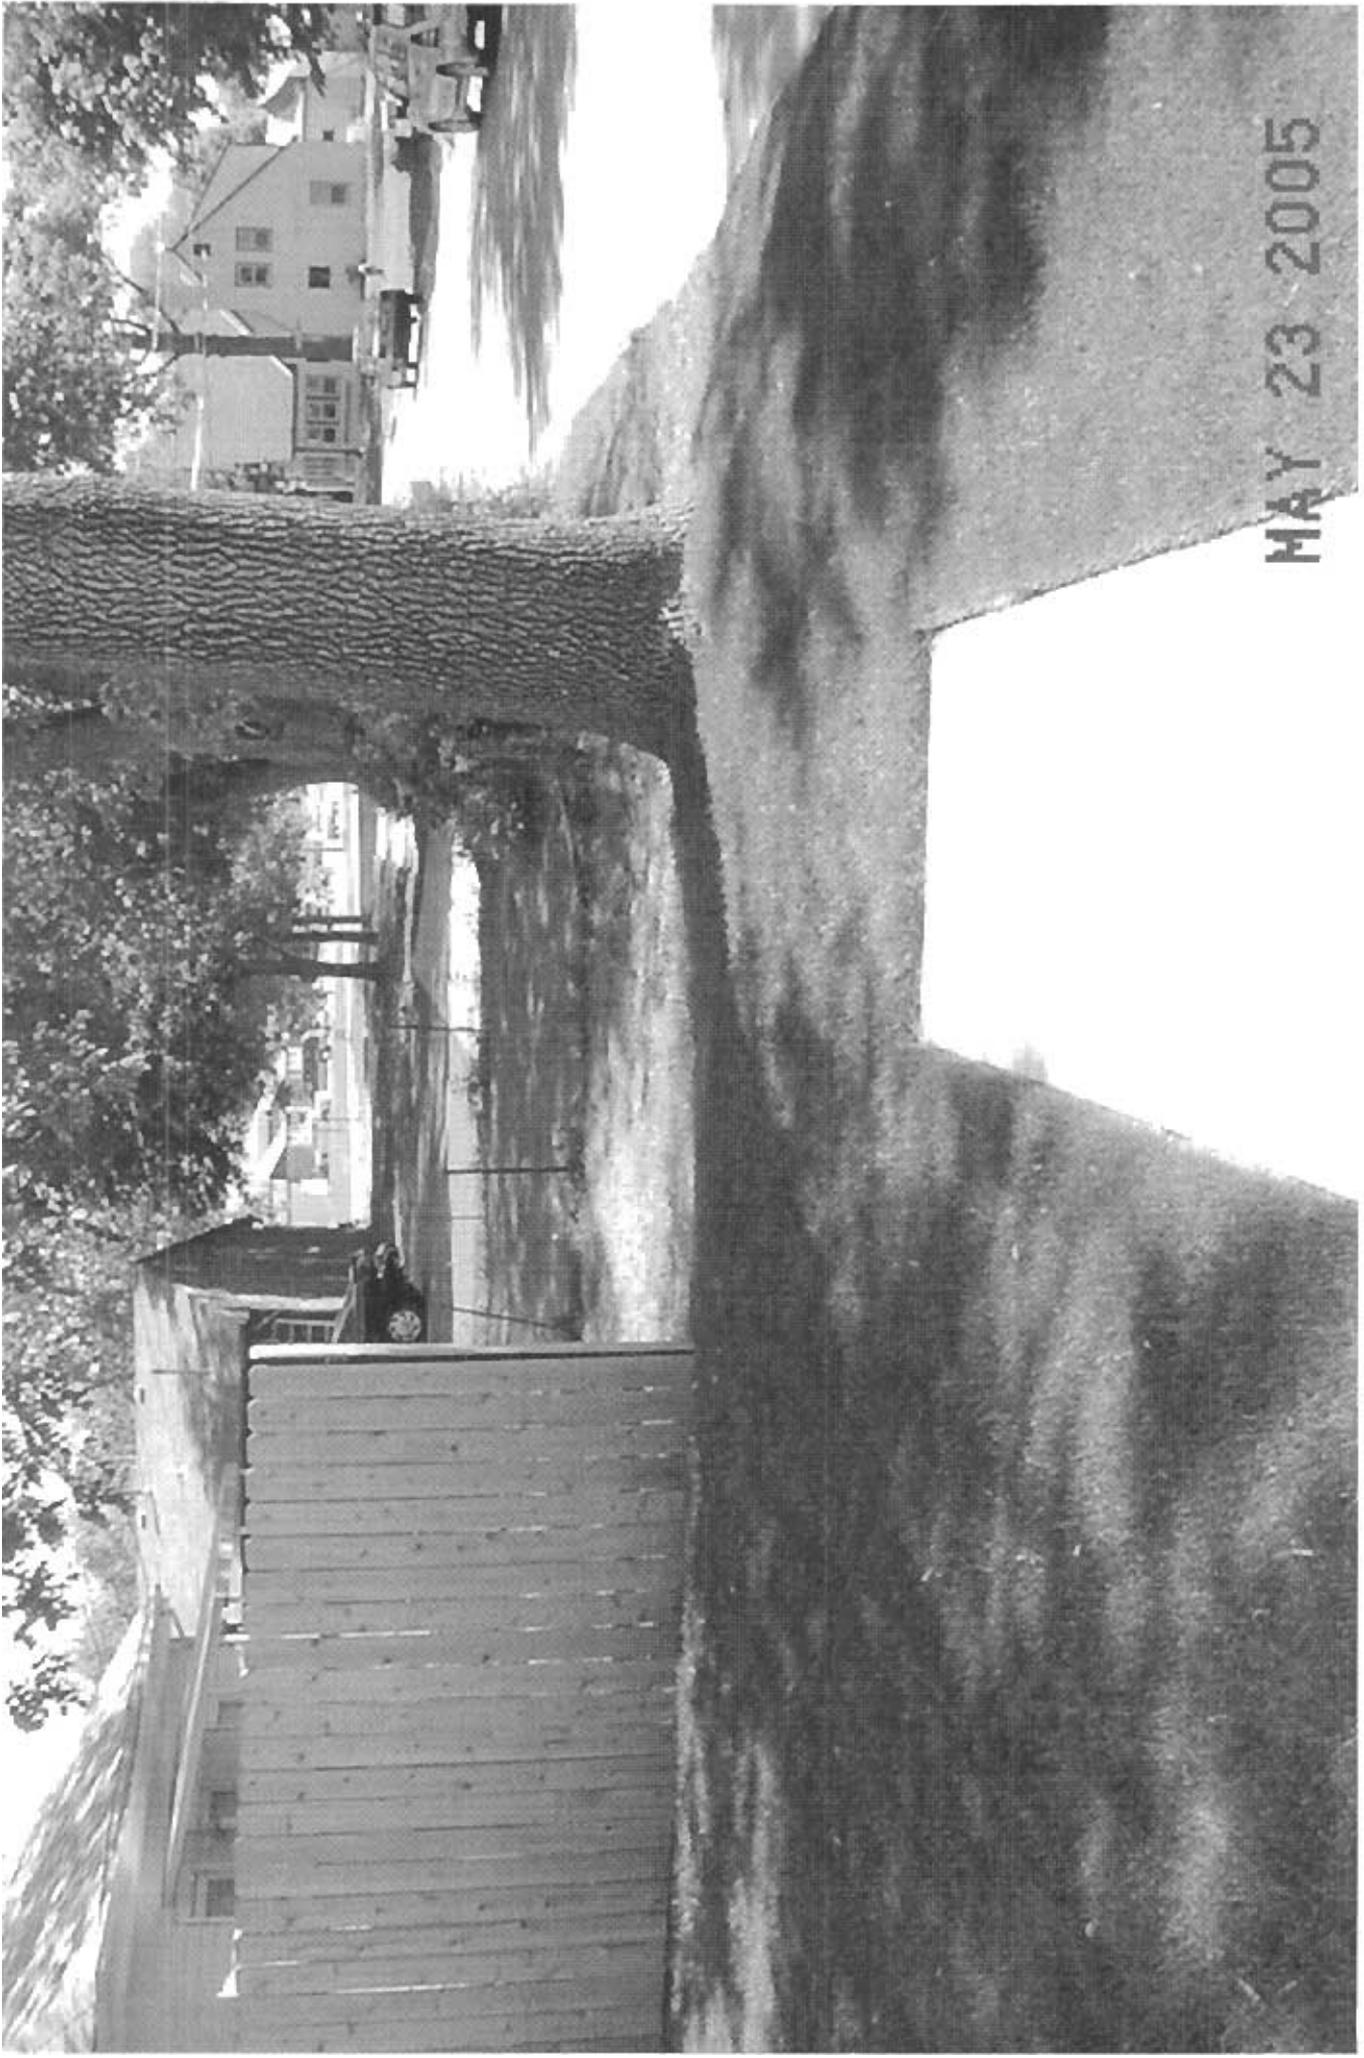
shows the view from the existing sidewalk south of the Dental Office
